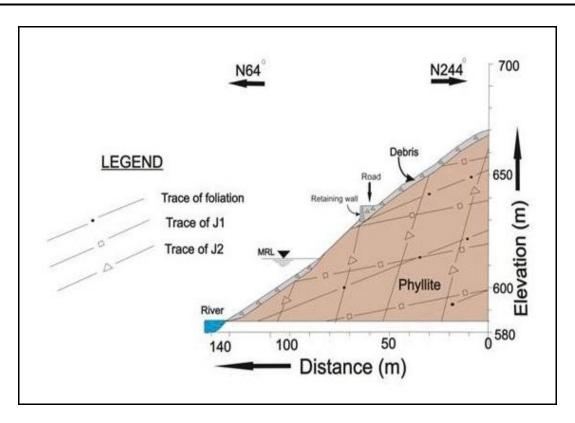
Geological Section of Slope RBS3 Located 1 km from Zero Bridge (near Pumping Unit)
